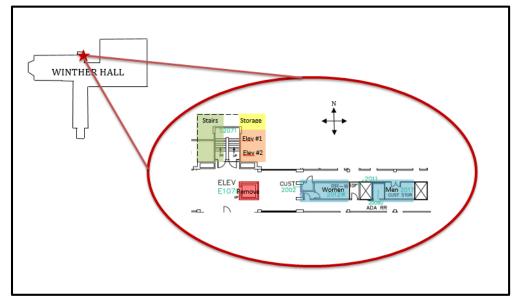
Zoomed-in View of Efficient Circulation Floor Plan
